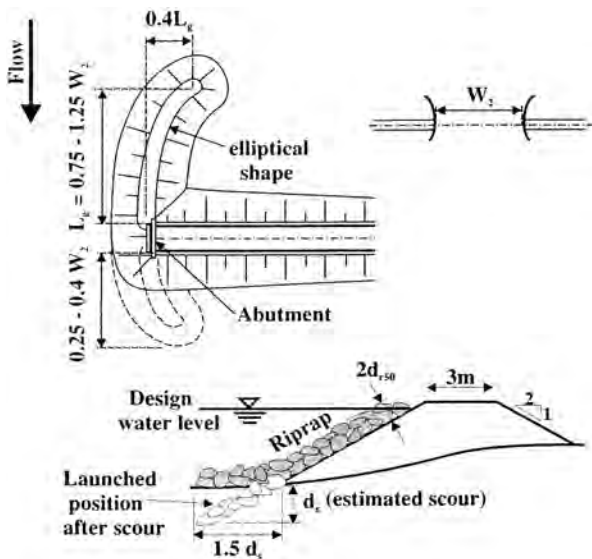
Design details for guidebanks at bridge crossing (from Melville and Coleman, 2000).
